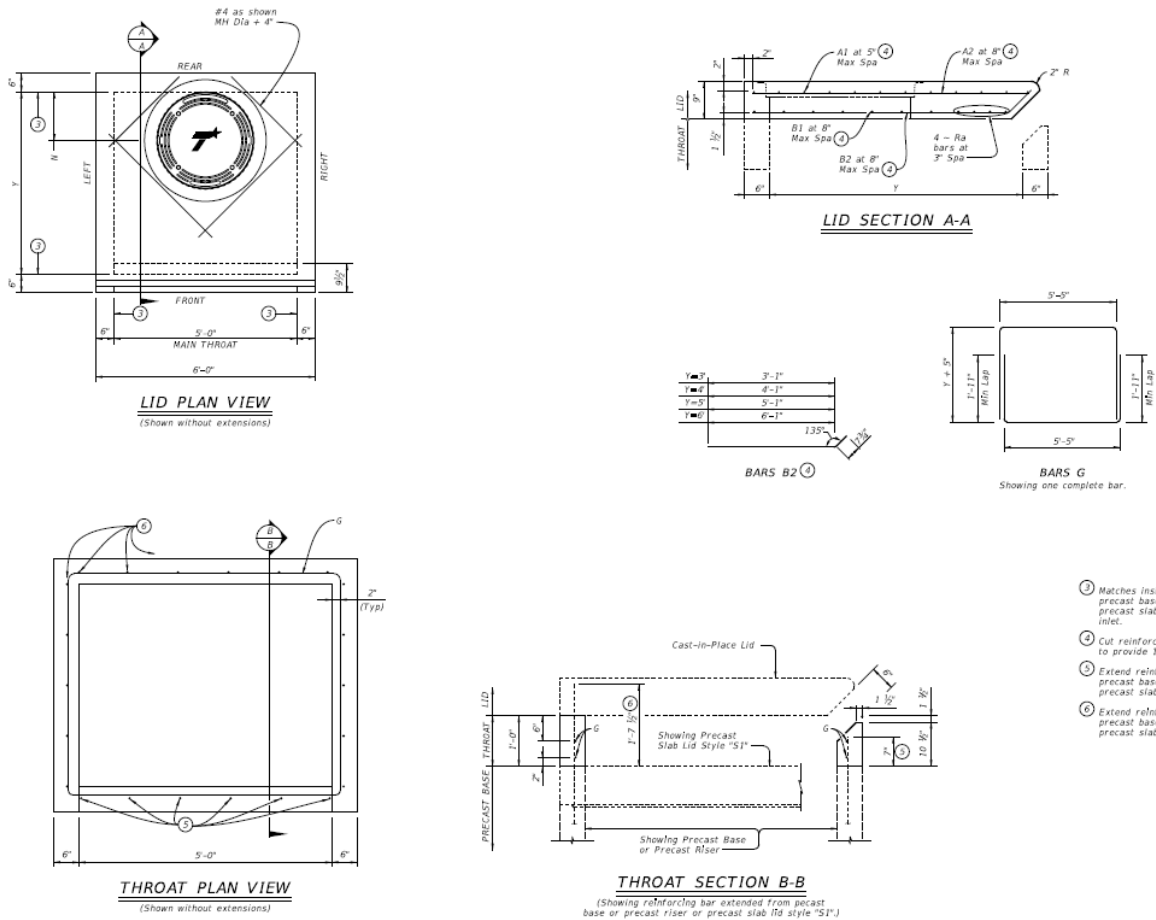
Example of Monolithic Inlet—TxDOT Cast-in-place Concrete Curb Inlet (8).
